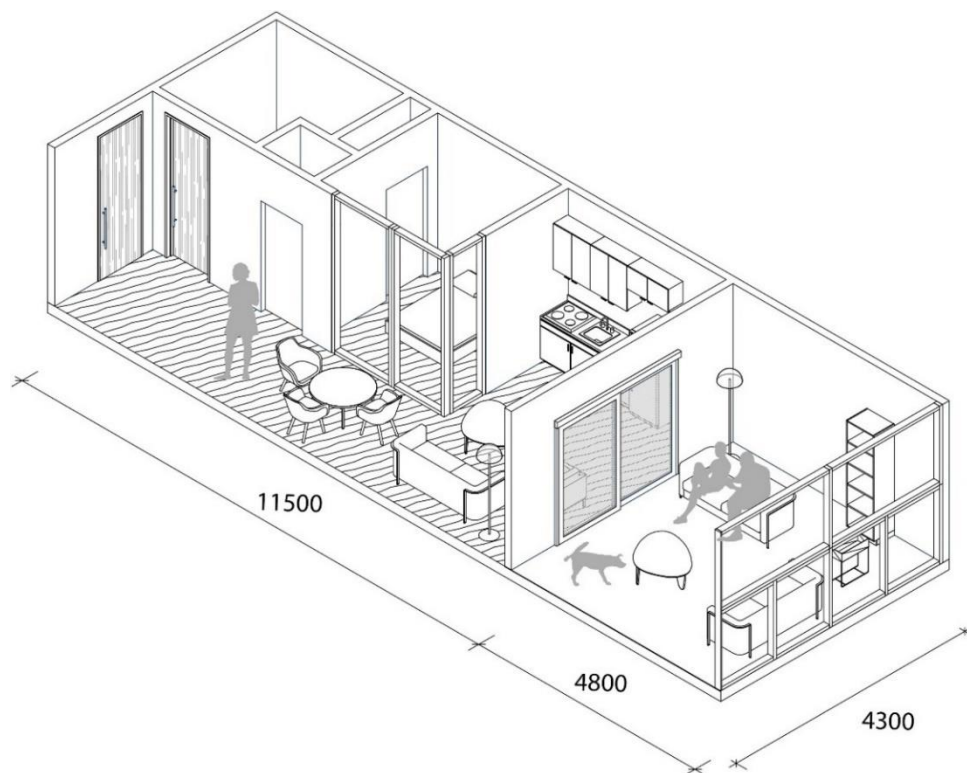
Axonometric section of proposed balcony as living space, this would require enlarging the balcony space
